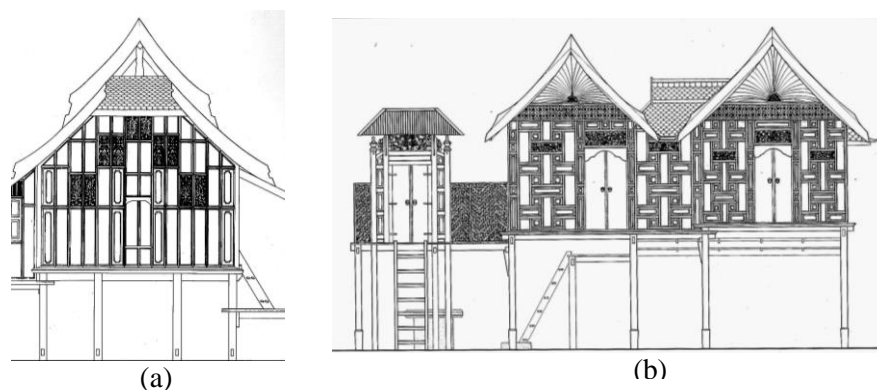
(a) The layout of perforated wall ventilation panels at Wan Embong's house and (b) Wan Sulong's house
